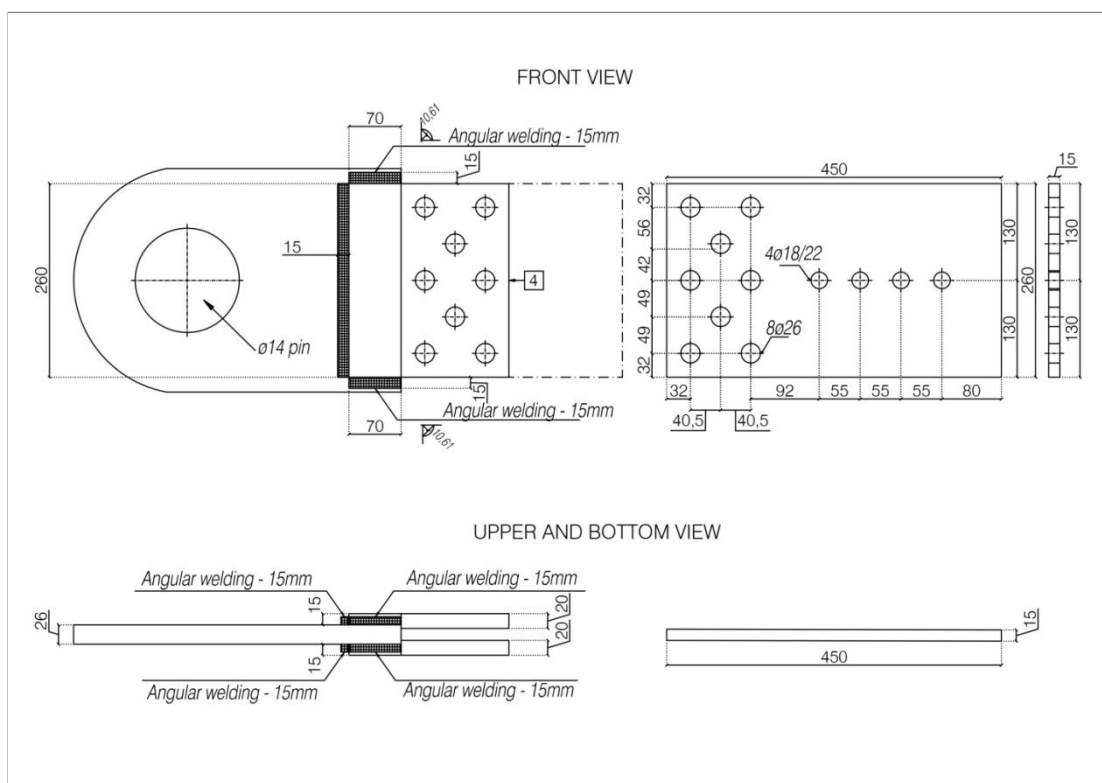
Construction details of corner connection modular systems in PF (measures in mm)
